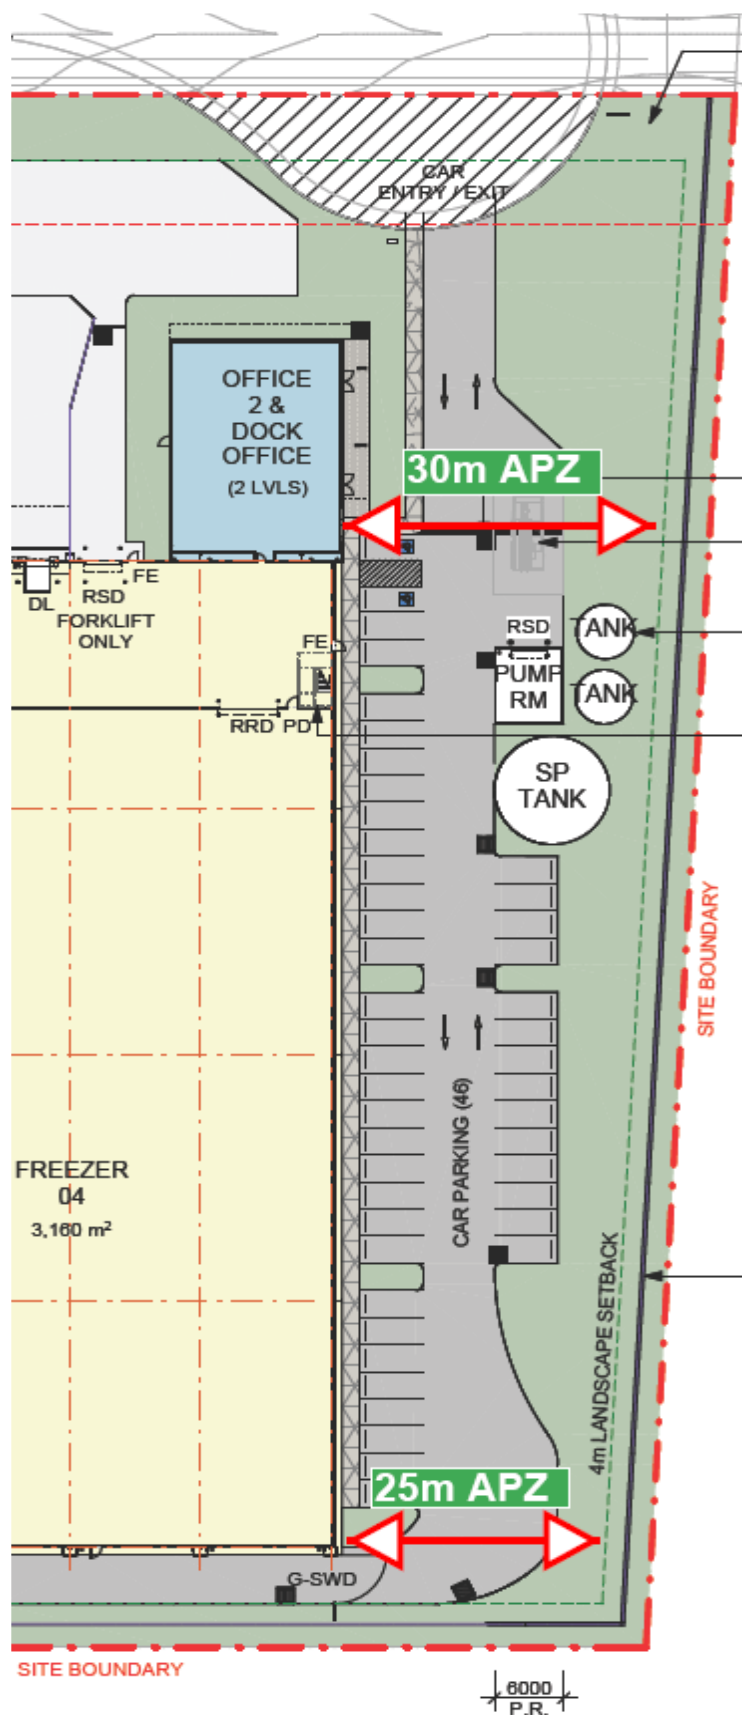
Plan of Asset Protection Zone/Defendable Space to the Lot O Warehouse and Distribution Centre.
